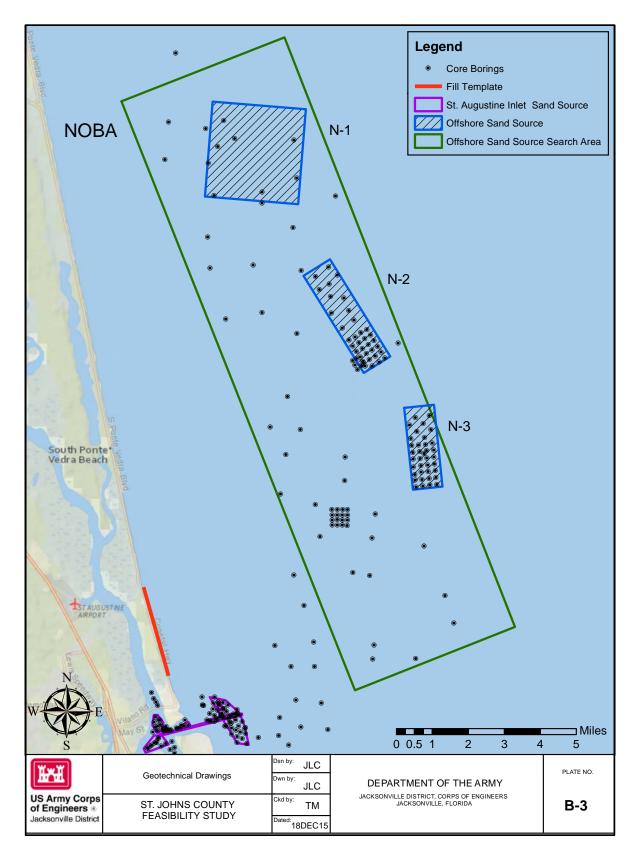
NOBA, Vibracore Boring Locations, and Proposed Sand Sources.
